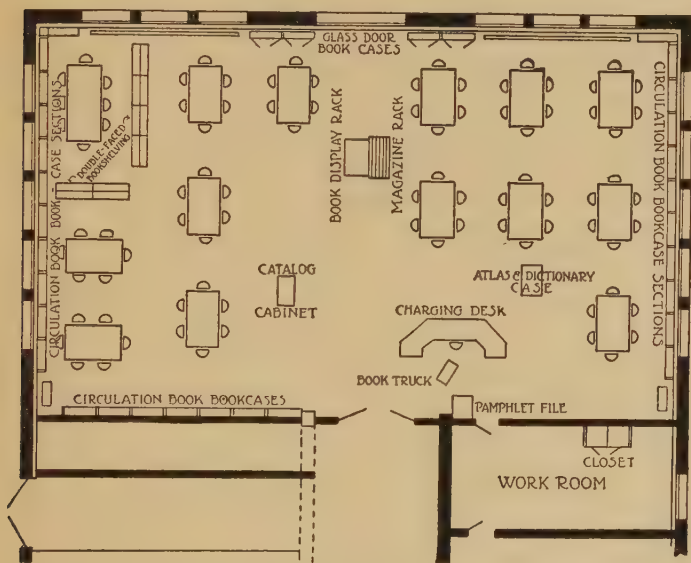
Floor plan of library in McKinley Junior High School, Los Angeles
